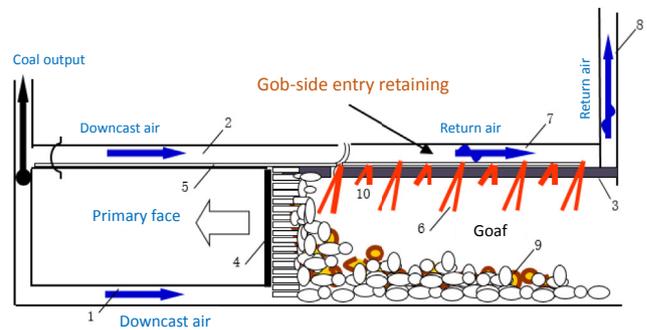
Integrated pillarless coal mining and gas drainage with Y-type ventilation. Number 1 is panel air intake, 2 is secondary air intake, 3 is filled sidewall, 4 is longwall face, 5 is gas drainage pipelines, 6 is roof gas drainage boreholes along the face, 7 is panel air return, 8 is main air return, 9 is goaf, and 10 is floor gas drainage boreholes along the face.
